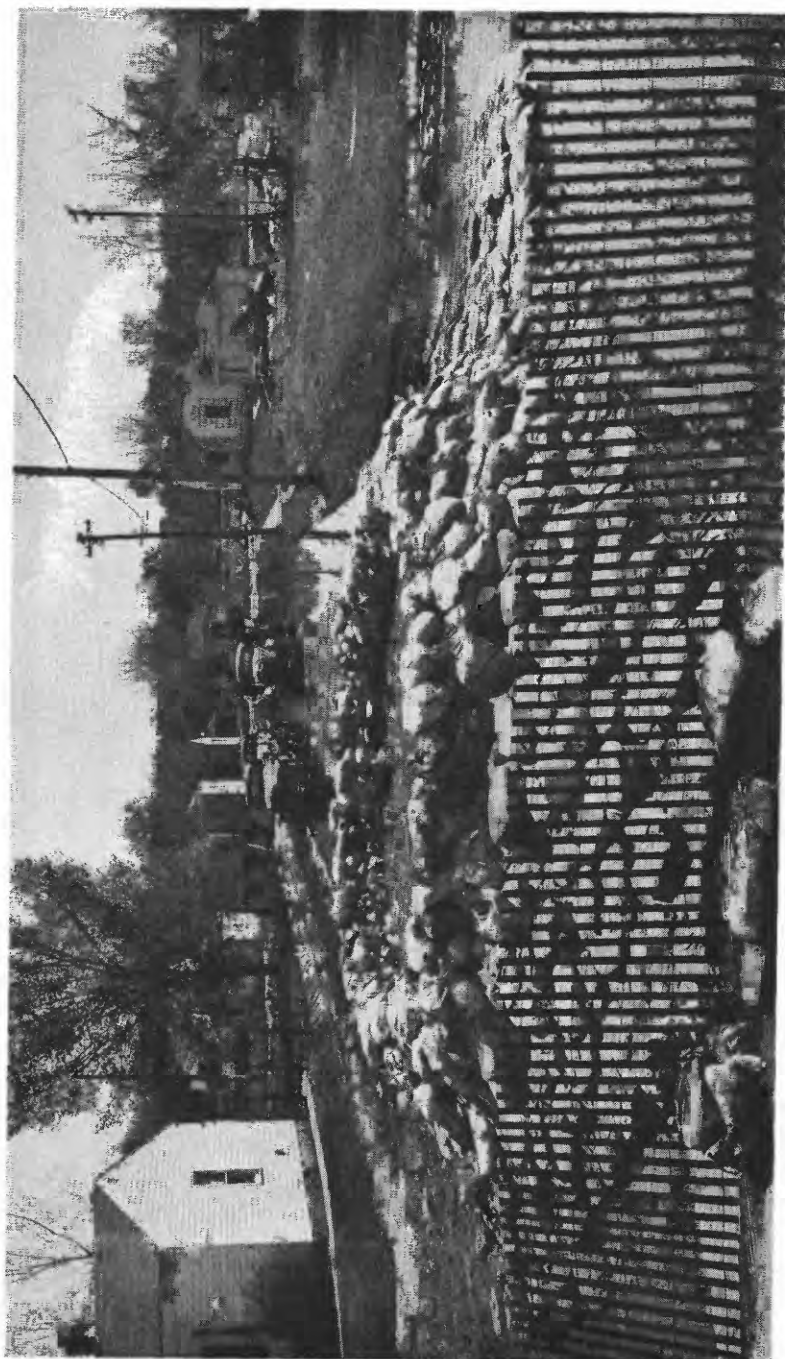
Sandbag ring dike that prevented reverse flow at sewer manhole in the Garden addition of Davenport, Iowa. Photograph by Corps of Engineers.
